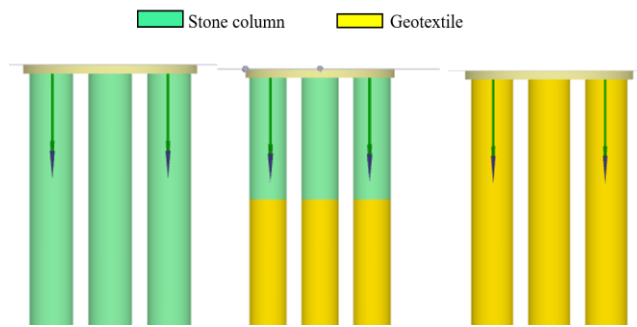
Ring footing with (a) Ordinary stone column (b) half encased stone column ( $L_r/B = 0.75$ ) and (c) fully encased stone column.
